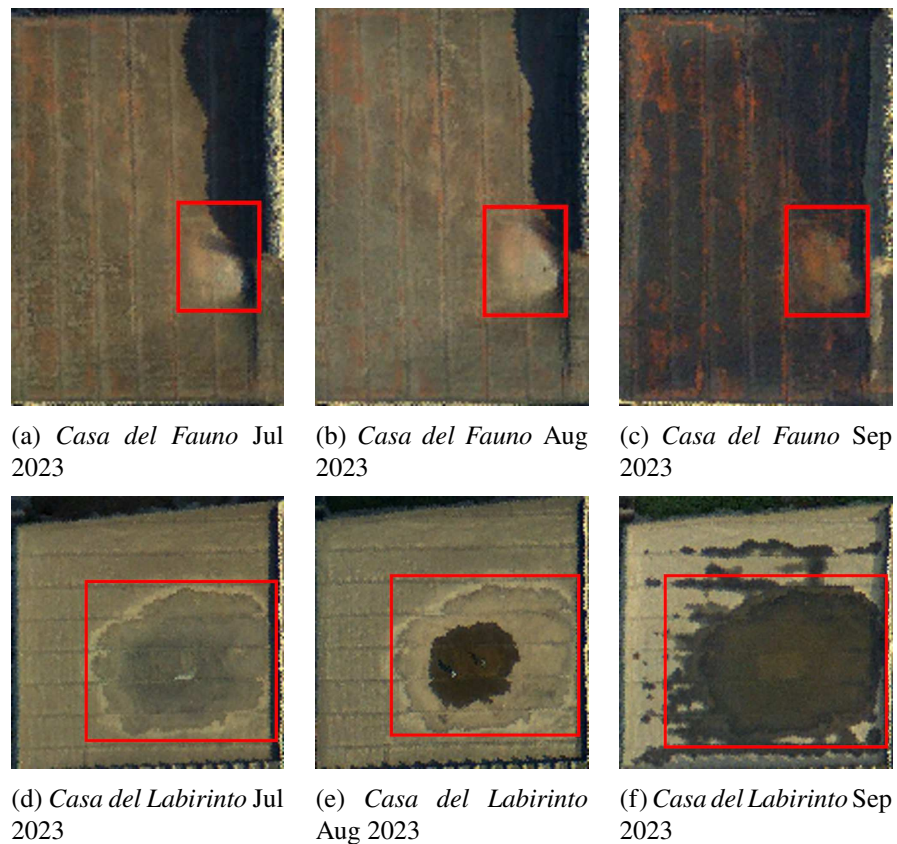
Damaged Conduits on *Casa del Fauno* and *Casa del Labirinto*, (Red rectangles Highlight the Damage).
